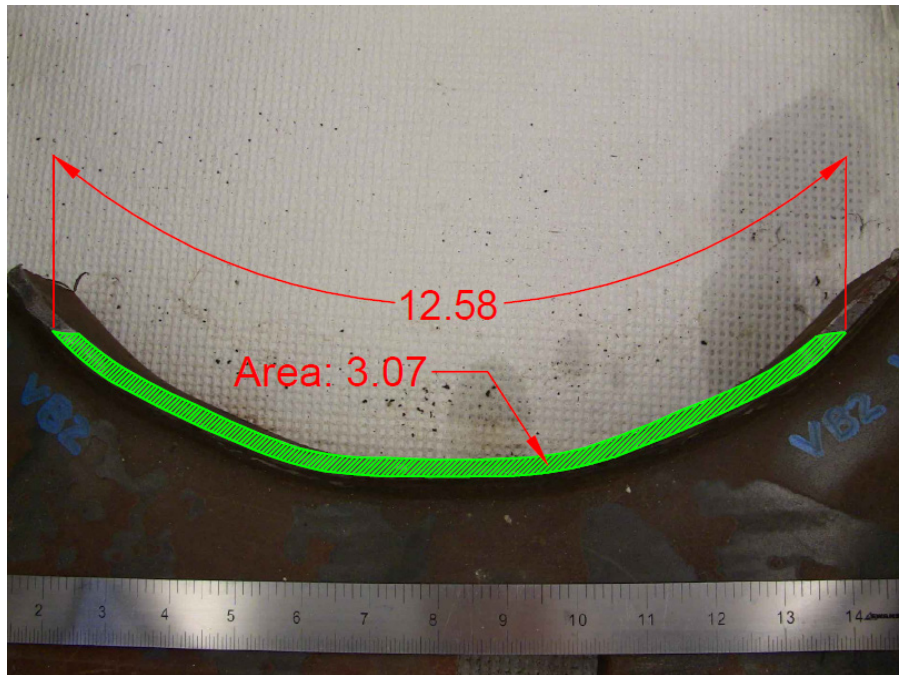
Photo. Specimen 1G6 fracture surface.
